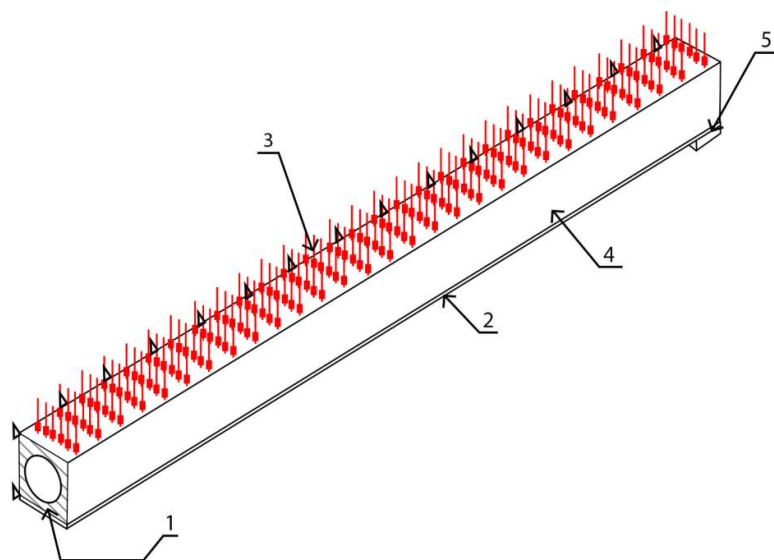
Scheme of applying a mechanical load to the upper surface of a fragment of a reinforced concrete hollow slab: 1 – plane of symmetry; 2 – reinforcement; 3 – applied pressure; 4 – concrete base; 5 – support surface
